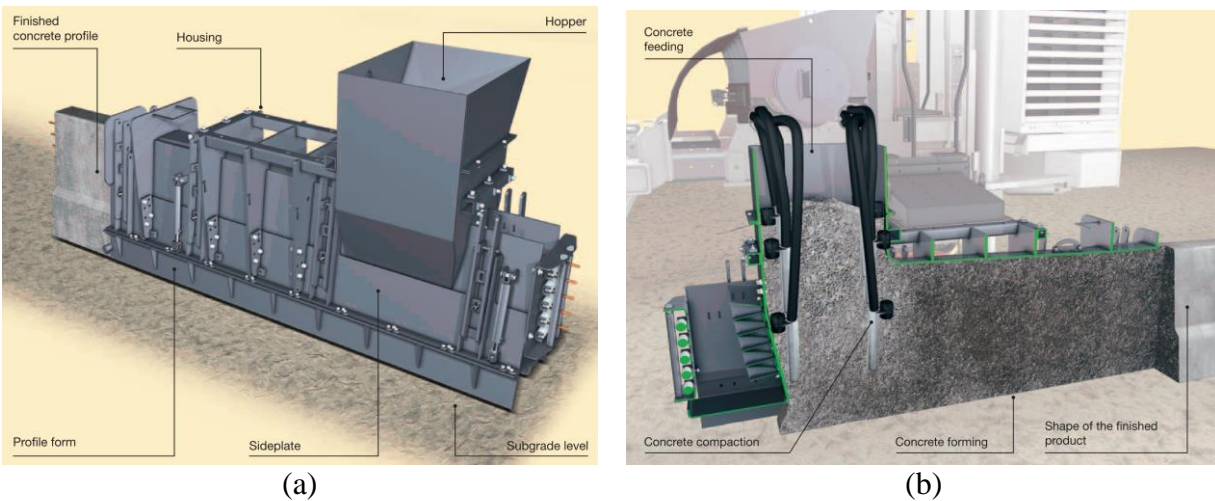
Railing construction formwork: (a) Railing formwork components; (b) Railing formwork cross-section with internal vibrators located within the hopper for compaction (Figure credit: Wirtgen Group)
